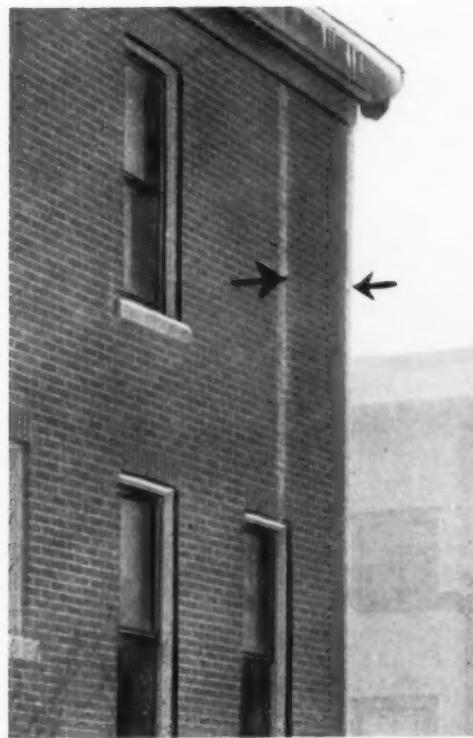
The gutter material does not extend sufficiently far up under the roofing to prevent moisture from soaking into the brick wall construction when the snow fall is heavy.
